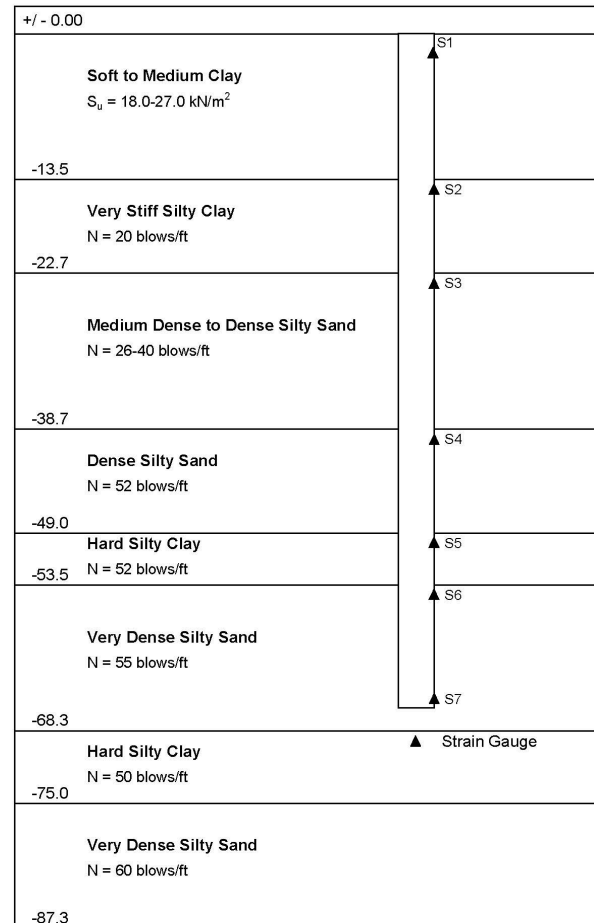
Soil stratuma and strain gauges installed in barrette piles
